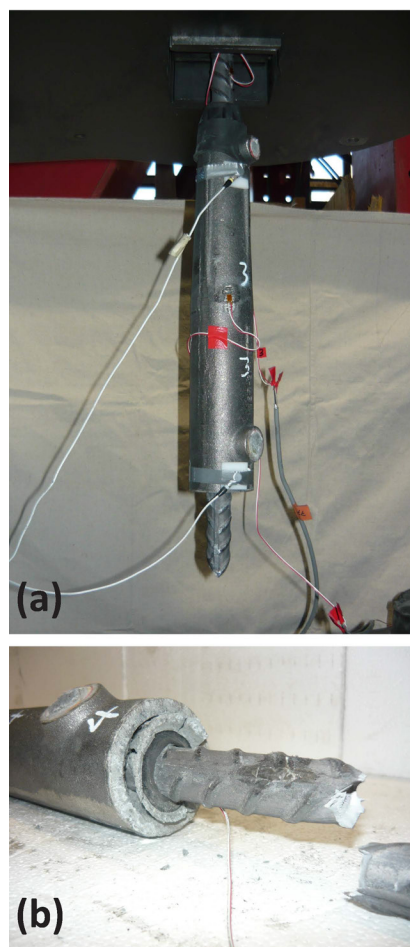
Failure of connector assembly due to reinforcing bar fracture: (a) Failure of connector assembly in testing apparatus; (b) Formation of grout cone.
